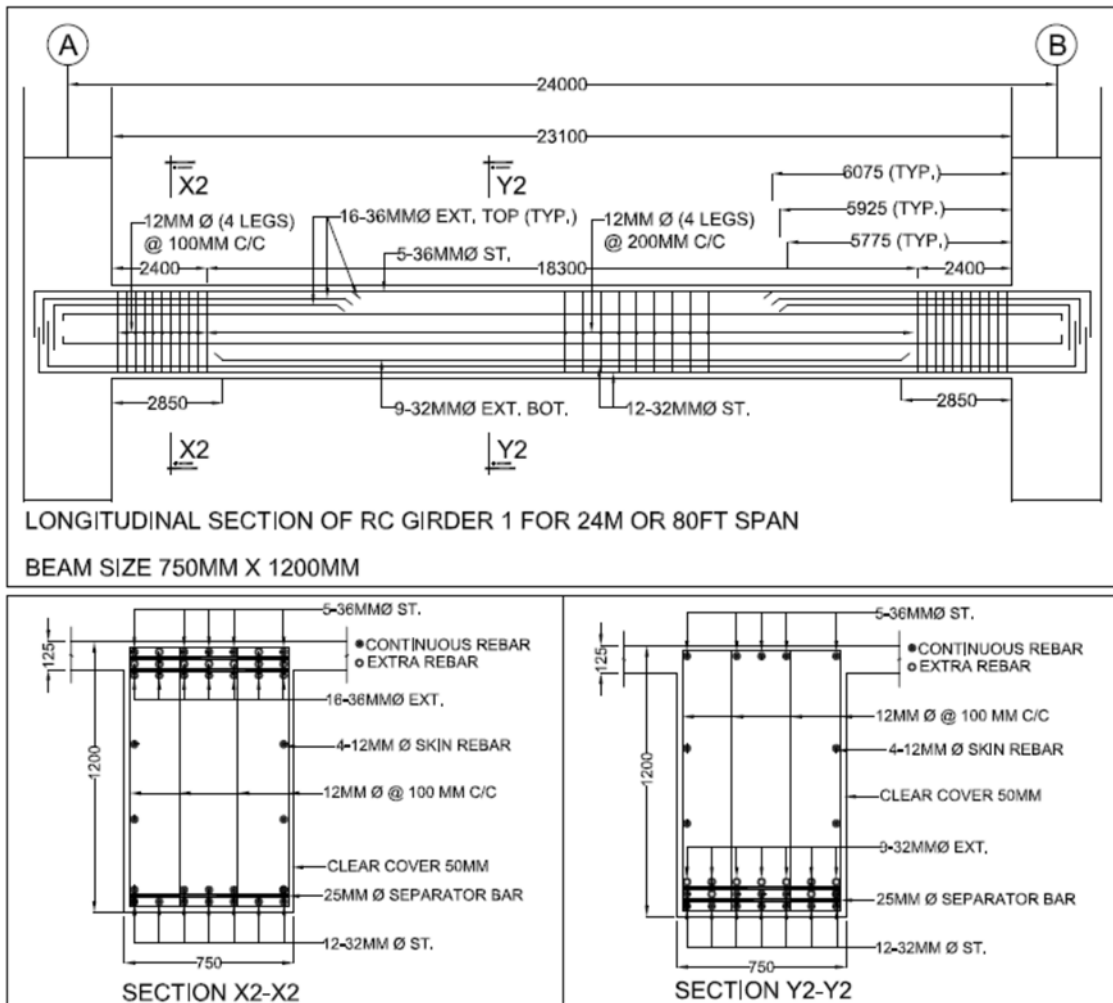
Reinforcement detail of RC beam for 24m (80ft) span.
